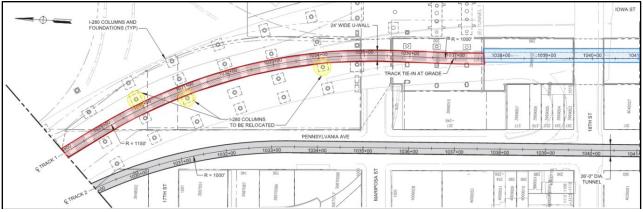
Interference and Connection Details in the 17th Street and Mariposa Street Area of Alternative C. New Cut-and-Cover Tunnel (red), TBM Bored Tunnel (gray), Relocated I-280 Columns (yellow), and Existing Caltrain Tunnel No. 1.
